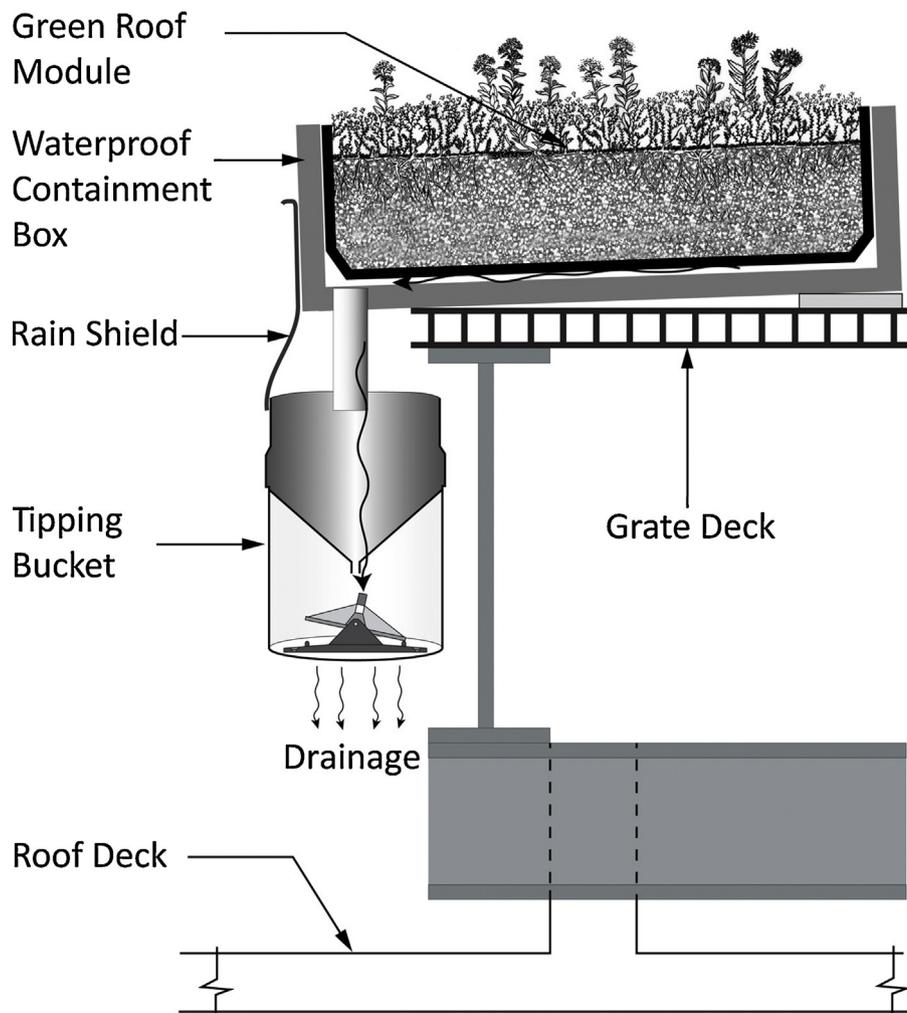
Cross section of green roof module, waterproof containment box, rain shield, and tipping bucket.
